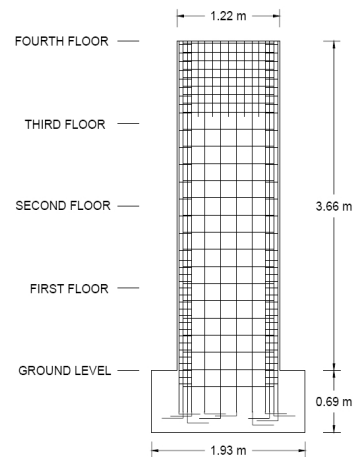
Elevation view of special RC shearwall test specimen[4]
